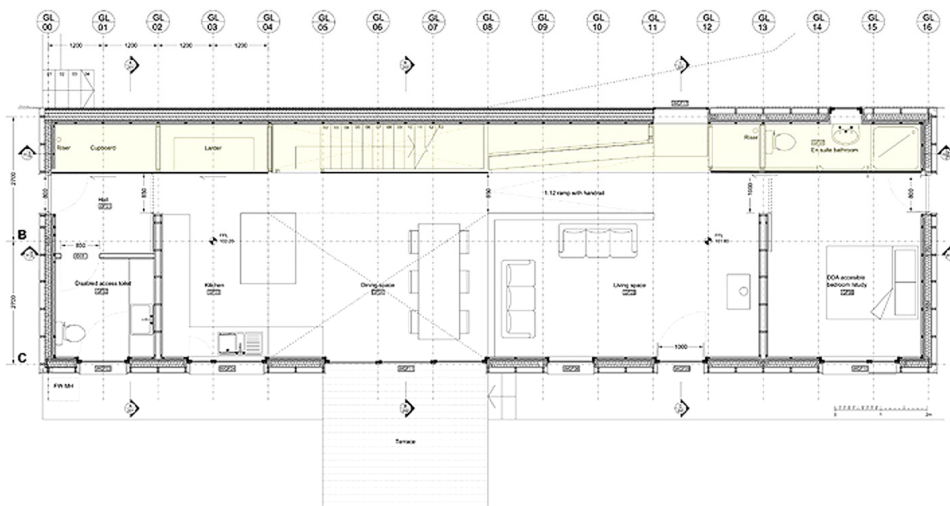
Spatial and constructional layout of ground floor showing structural grid
